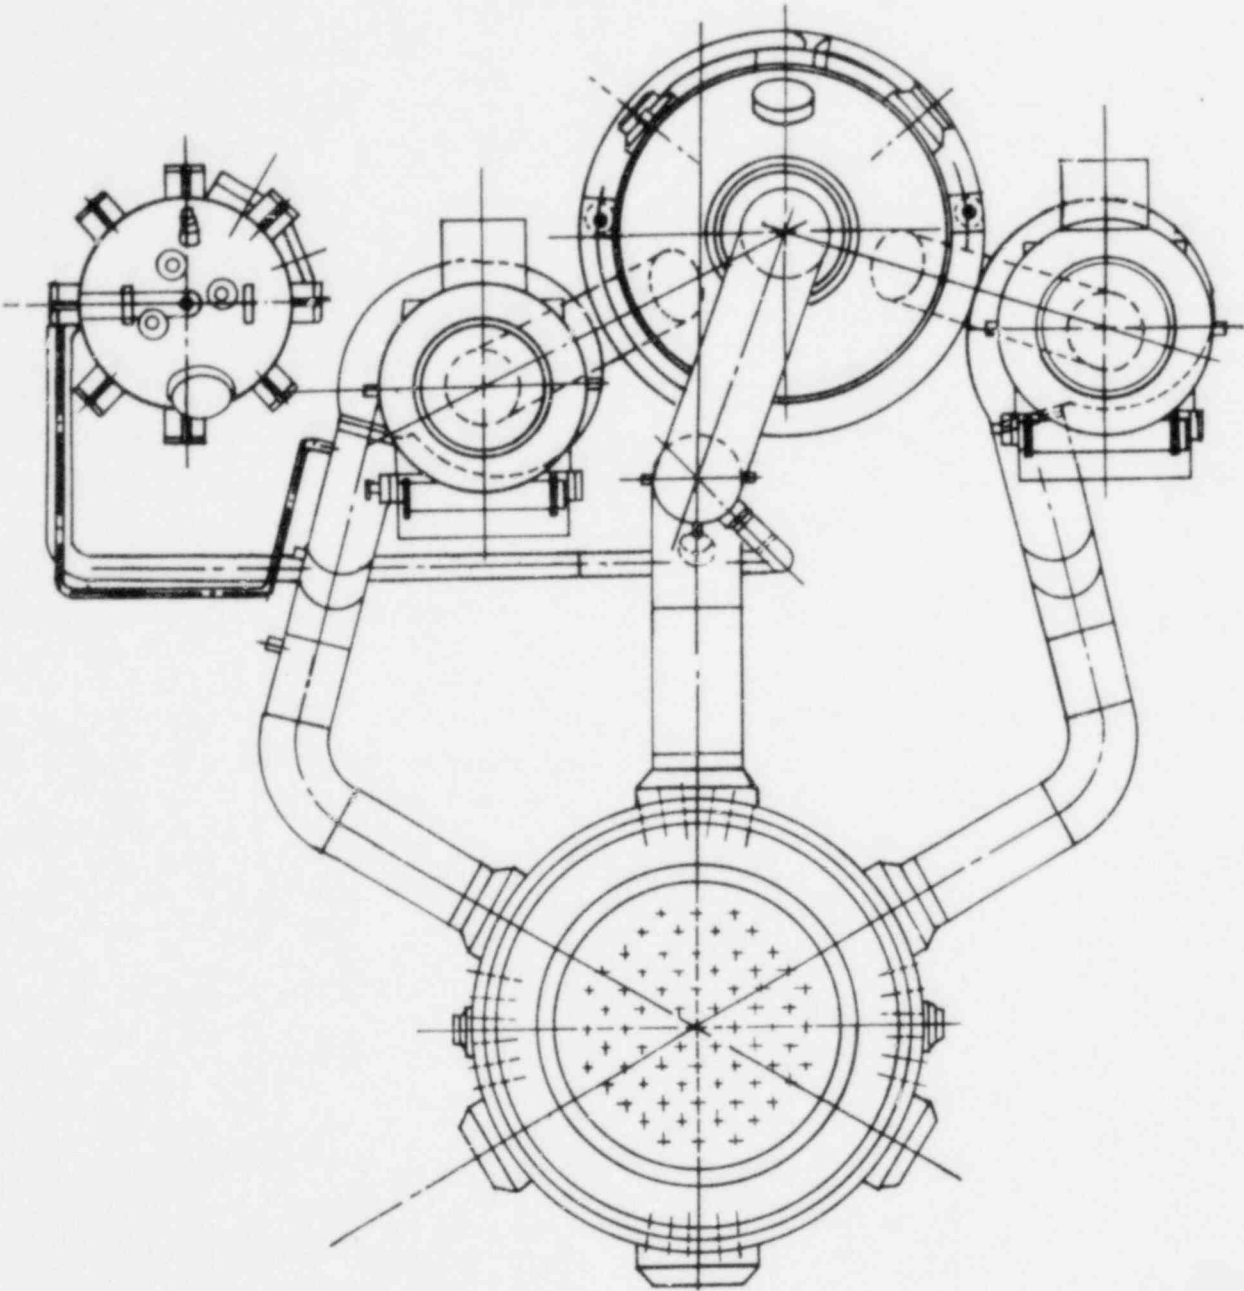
Skirt-Supported Plant, Elevation View (Unsupported Pump)
